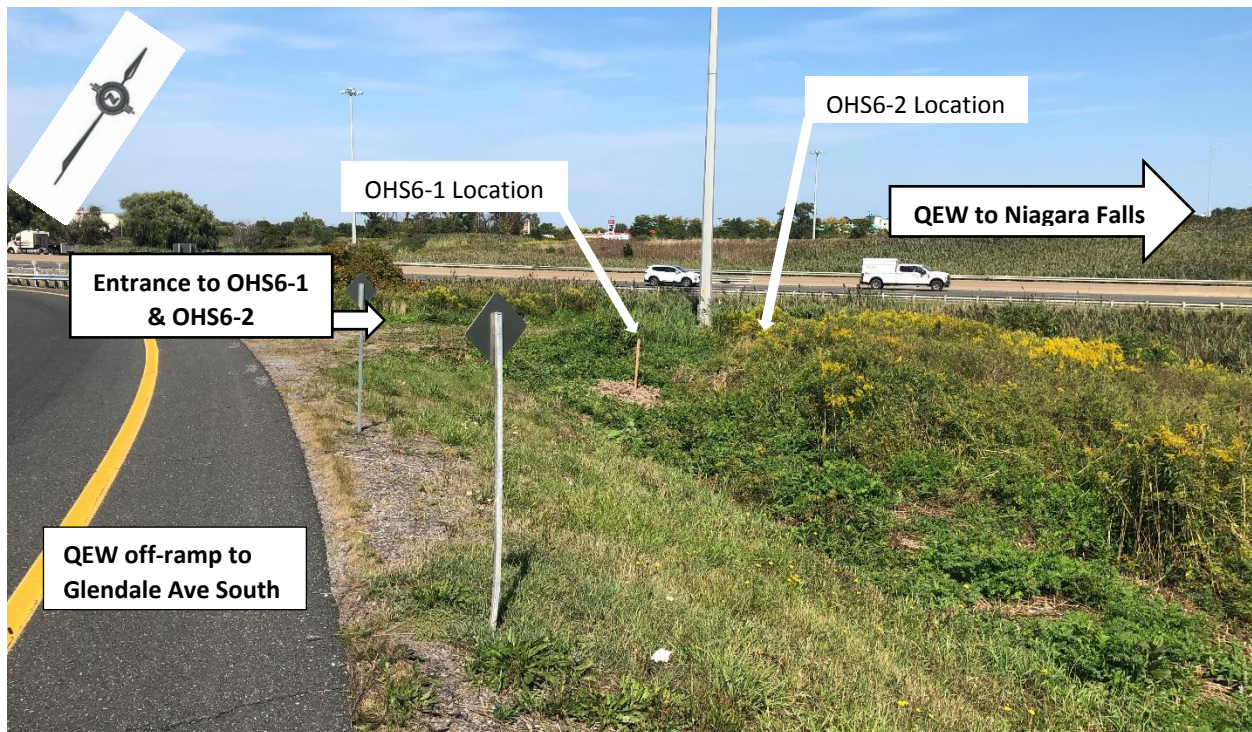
Looking towards Northwest: OHS6-1 & OHS6-2 Location (Sept 2019)
